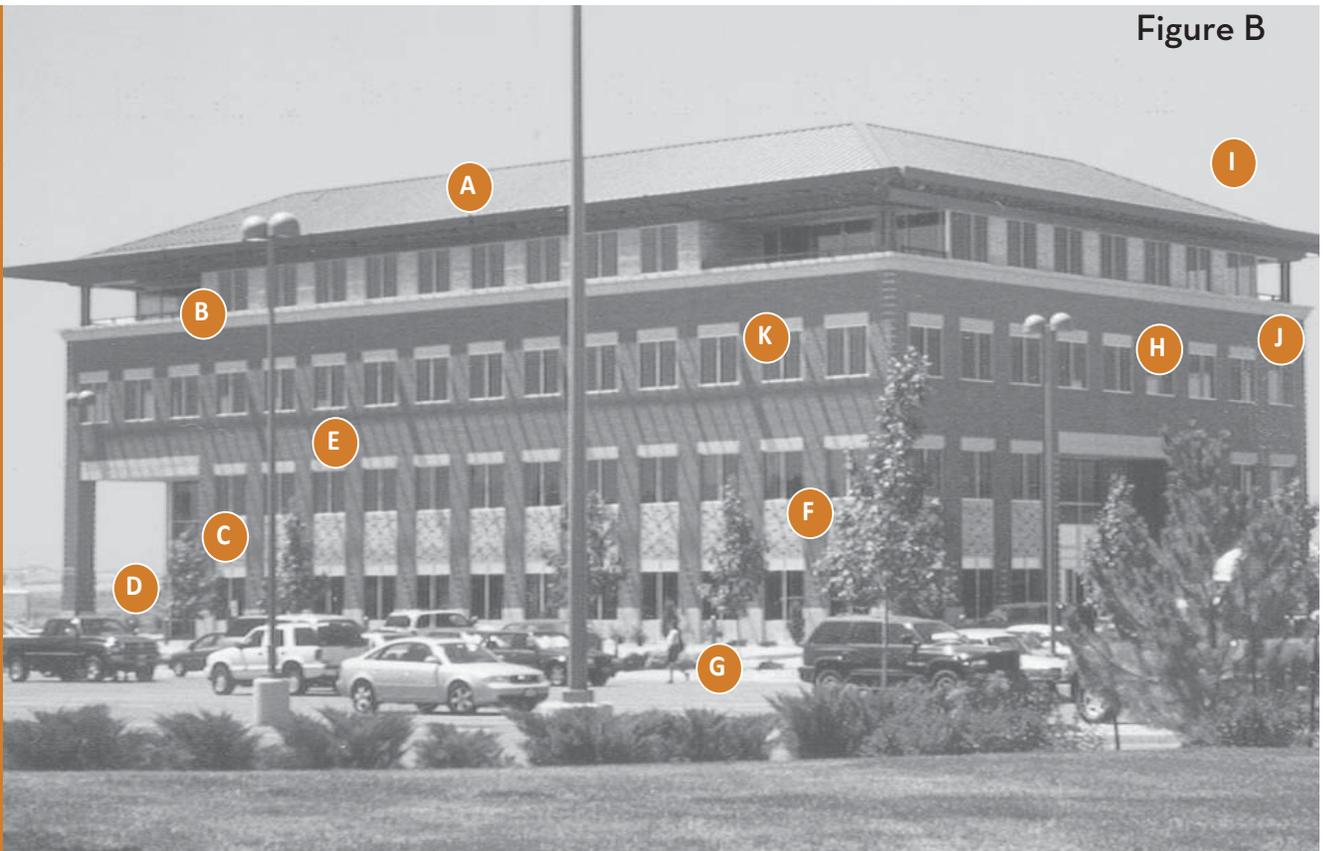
Segment the building into a series of structural bays. Notice how the brick masonry piers, spandrels, and recessed window openings express the underlying structure of the building.
